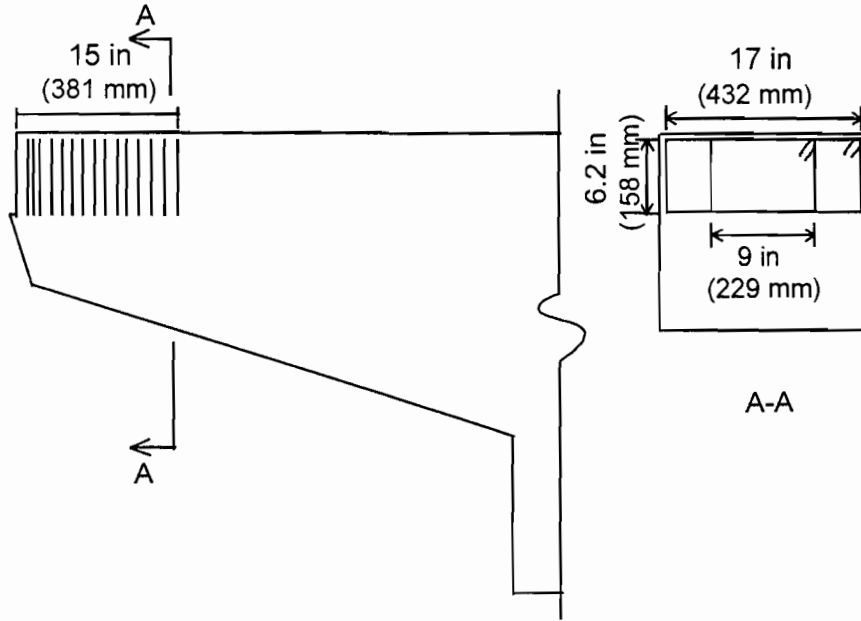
28 Detail of confinement reinforcement in bearing area of post-tensioning anchorage
